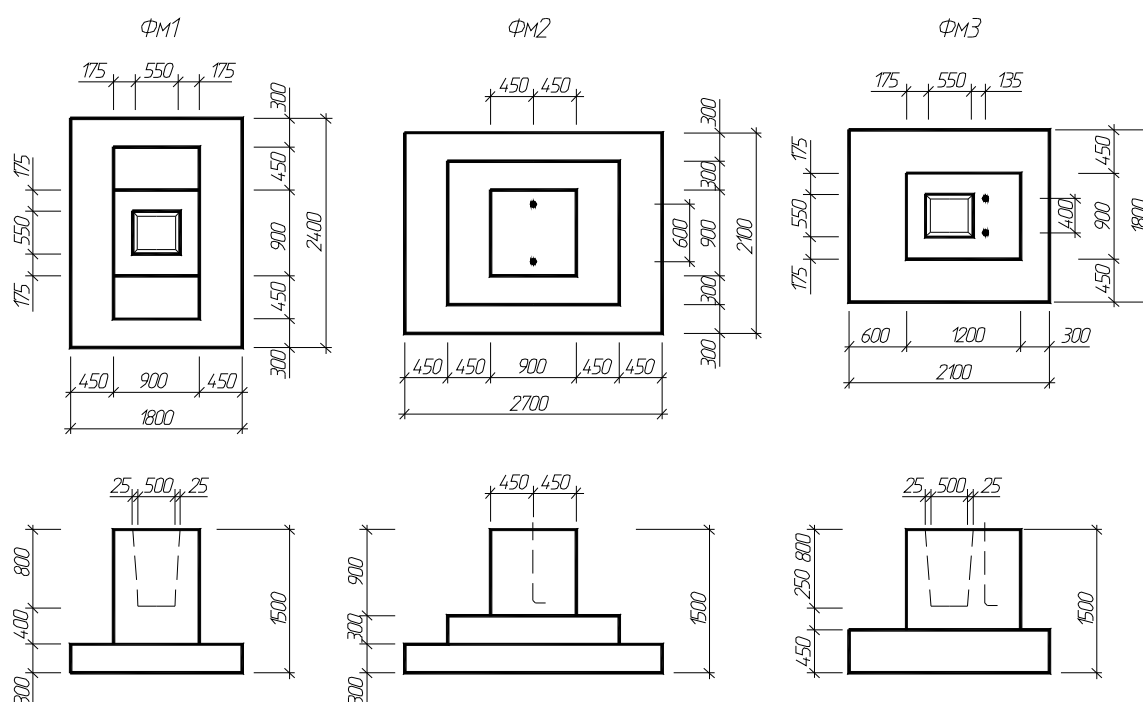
Reinforced concrete monolithic foundations.
